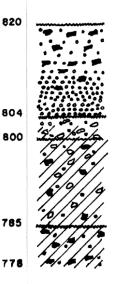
Relief Tunnel Excavation Units from CJP-08M-288.
